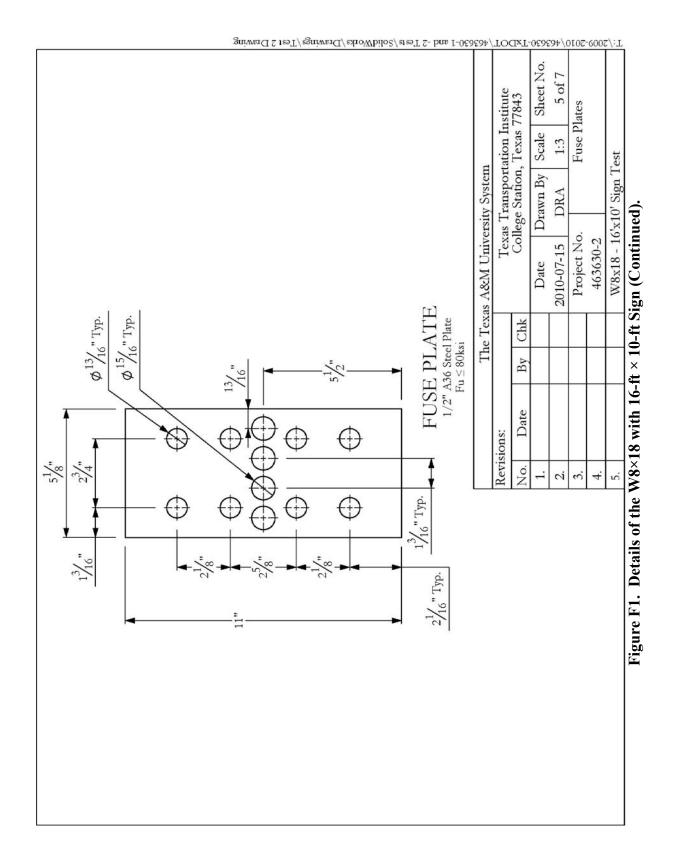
Details of the W8×18 with 16-ft × 10-ft Sign.
